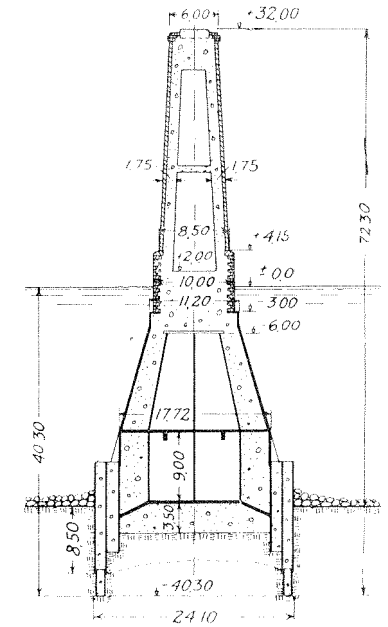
Bridge over the Lillebelt: Cross Section of Pier.
